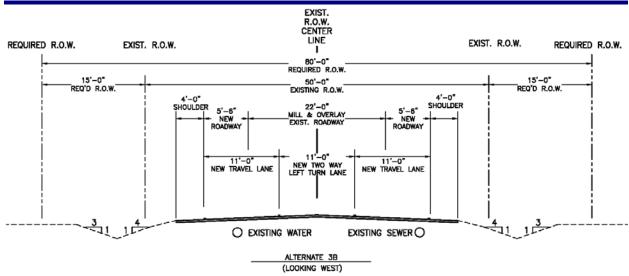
Proposed Typical Roadway Section for Two Way Left Turn Lane at 80' ROW along Minnesota Park Road (Source: RCLC)
